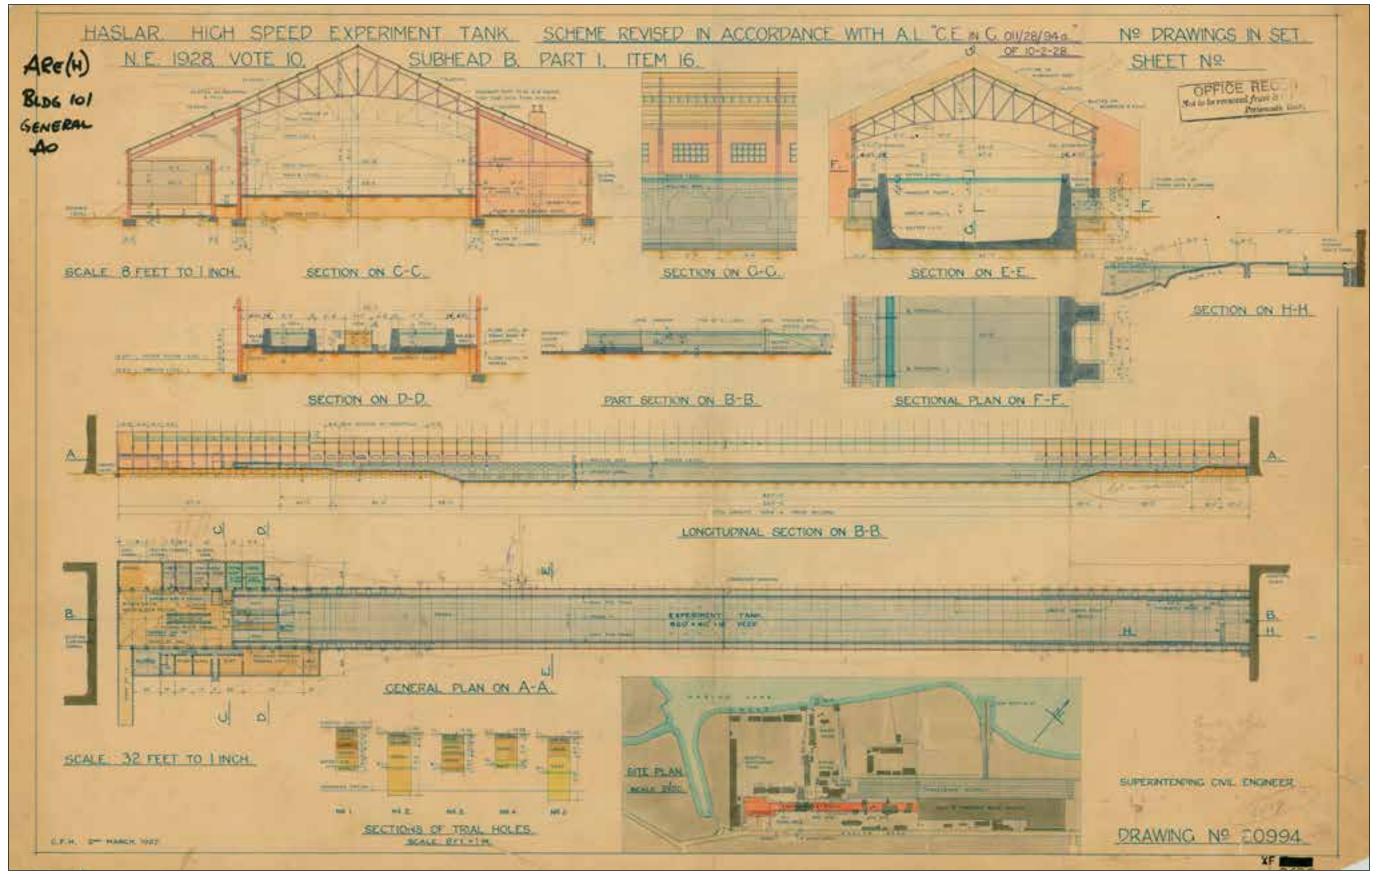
Plan, elevation and section of No 2 Ship Tank as proposed in 1927. The tank amd offices as built differed slightly from the plan, as indicated by various pencil annotations (HEA MD95/06498)
